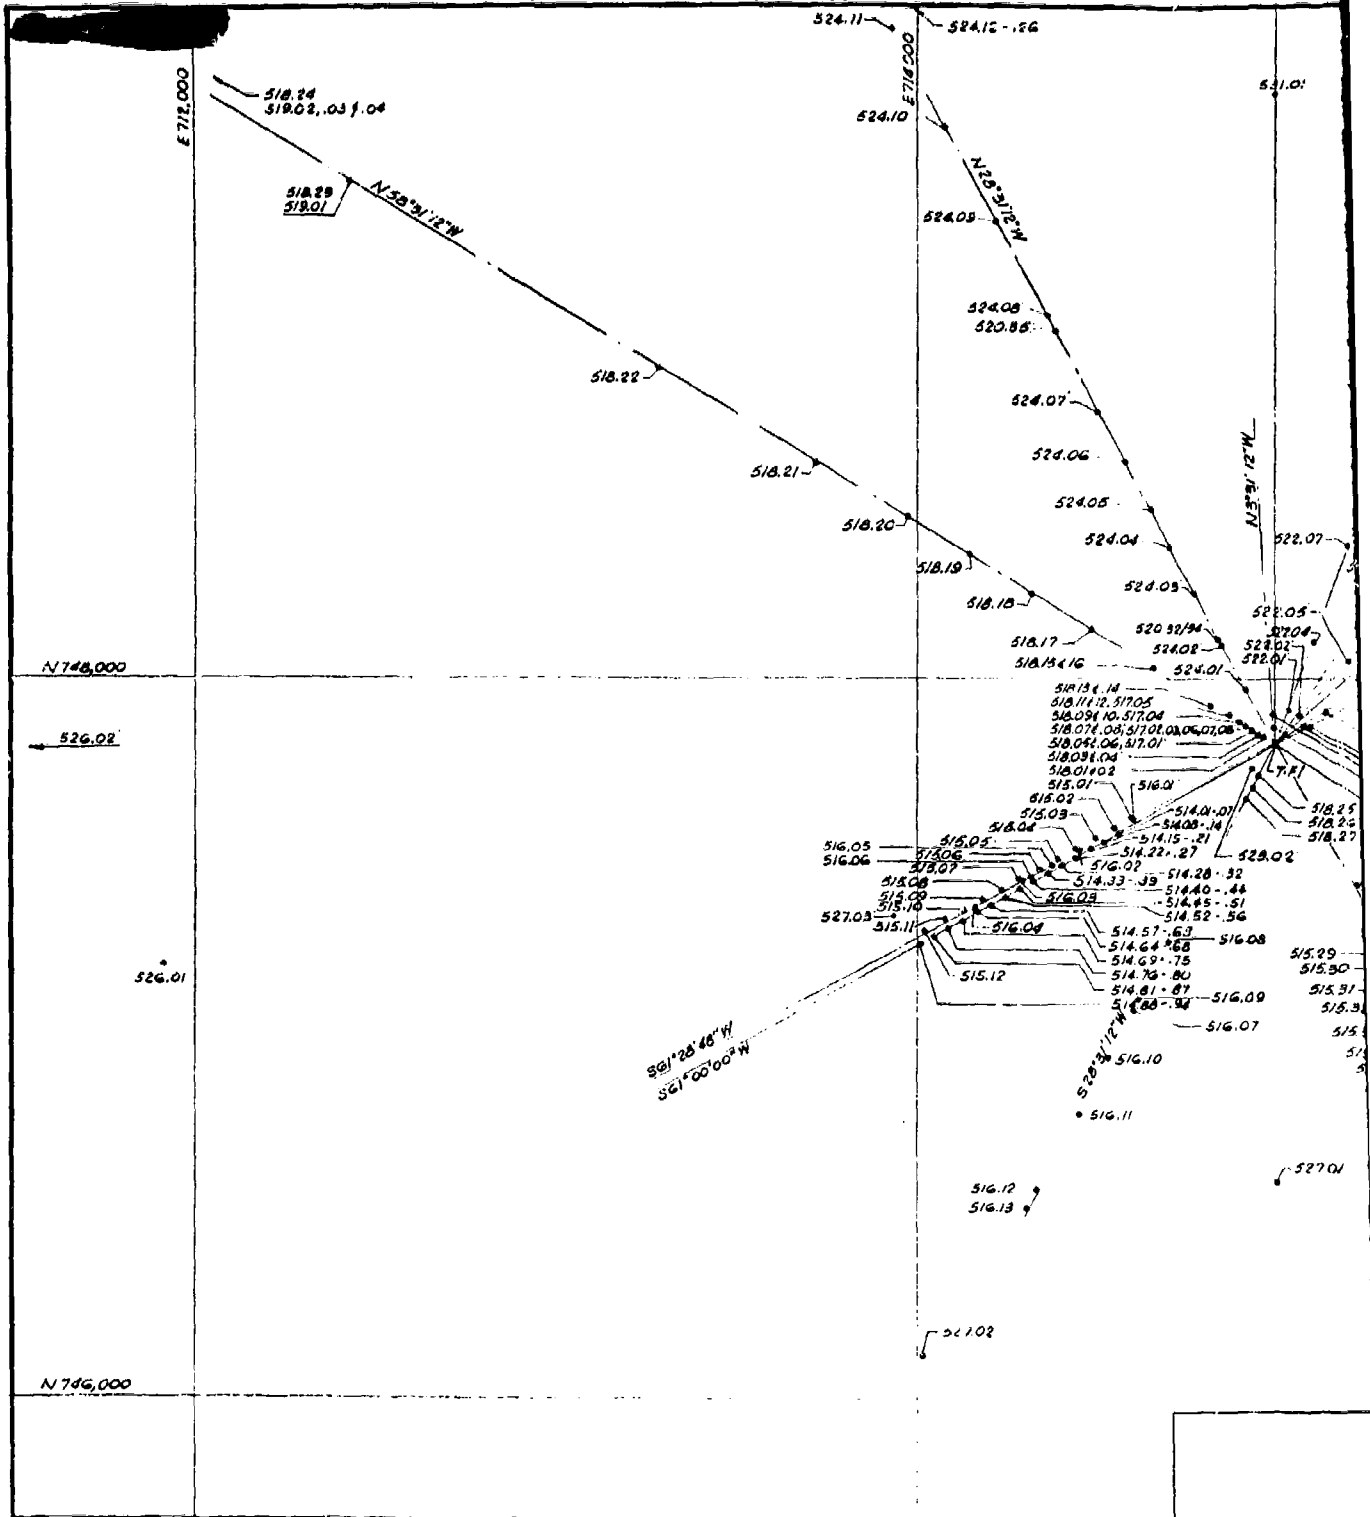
Area 5 — Detail Layout (Sheet 1 of 2)
